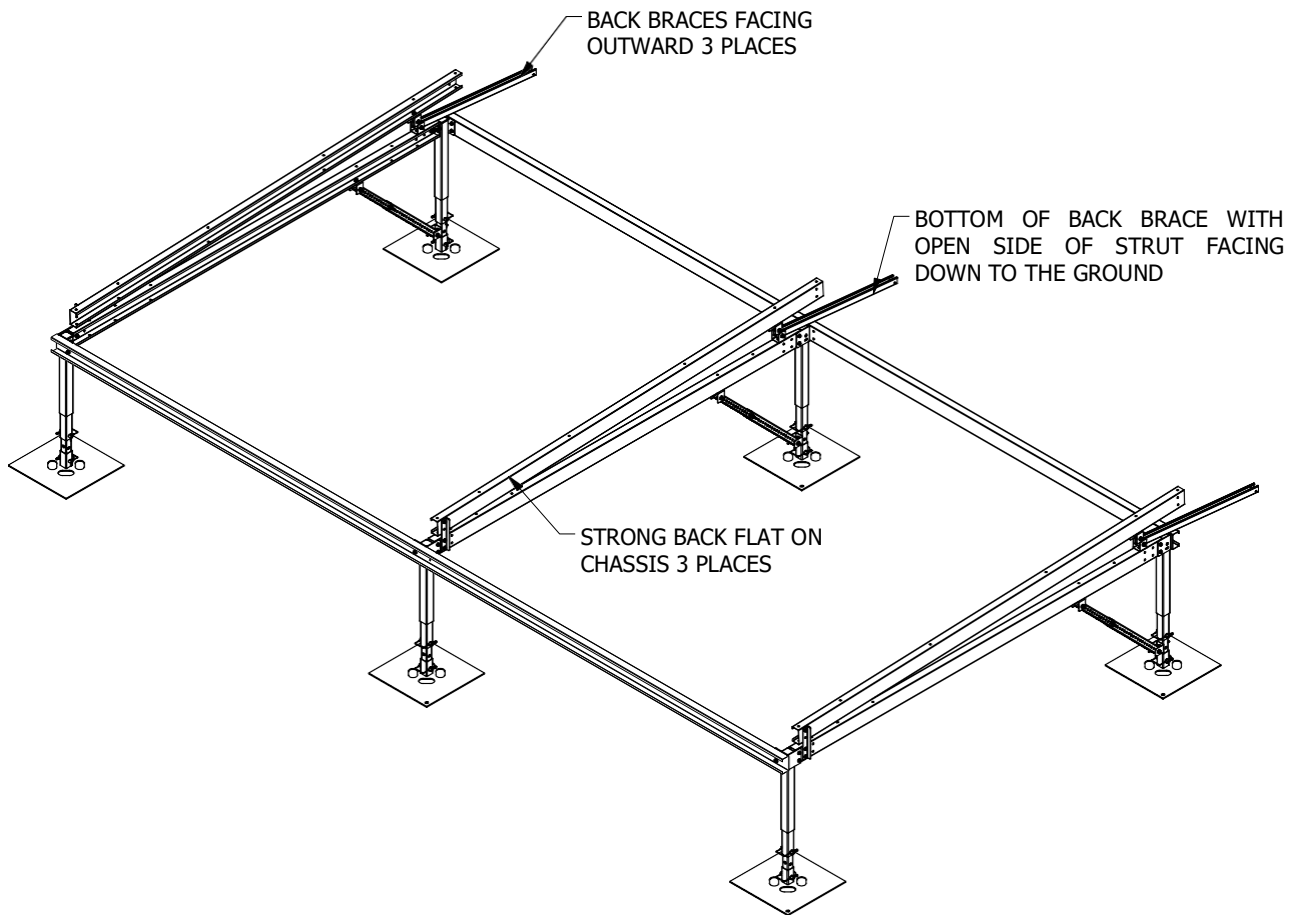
Alternate Back Brace Installation prior to installing Strut Rails.
